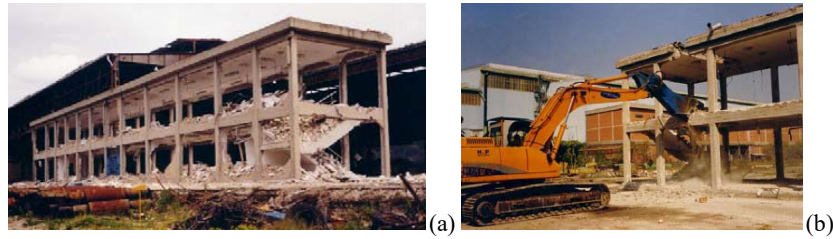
Side view of the original building: north-east (a) and north-west (b) facades.
